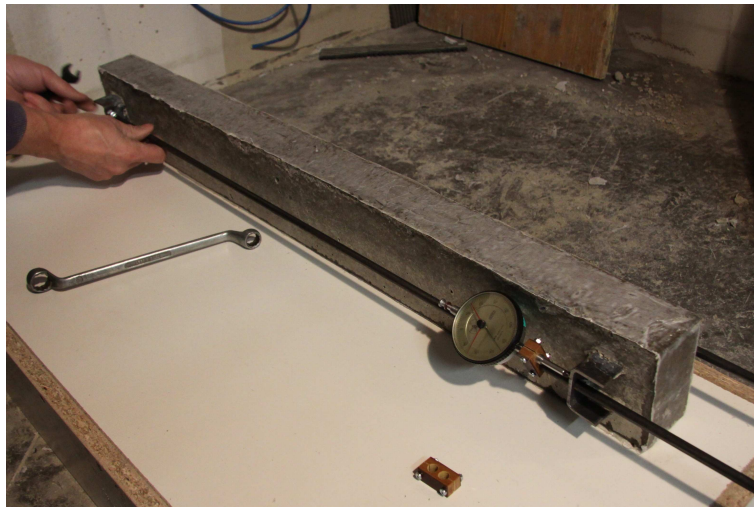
Prismatic specimens just after demolding. The circular steel bars attached to the gages pass through the holes in the U-profile which in this picture holds the specimens together.
